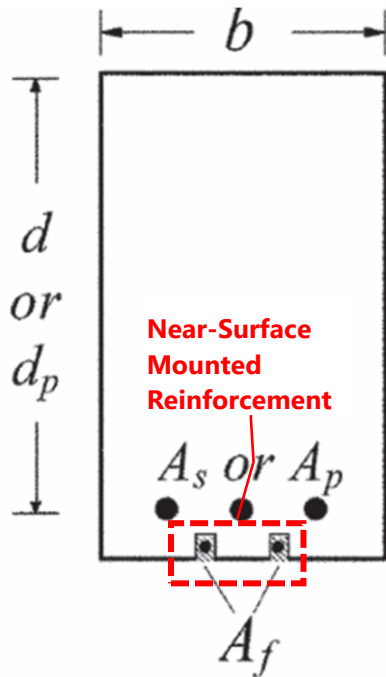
Section view of a reinforced concrete beam showing strengthening with near-surface mounted reinforcement (adapted from ACI 440.2-23)
